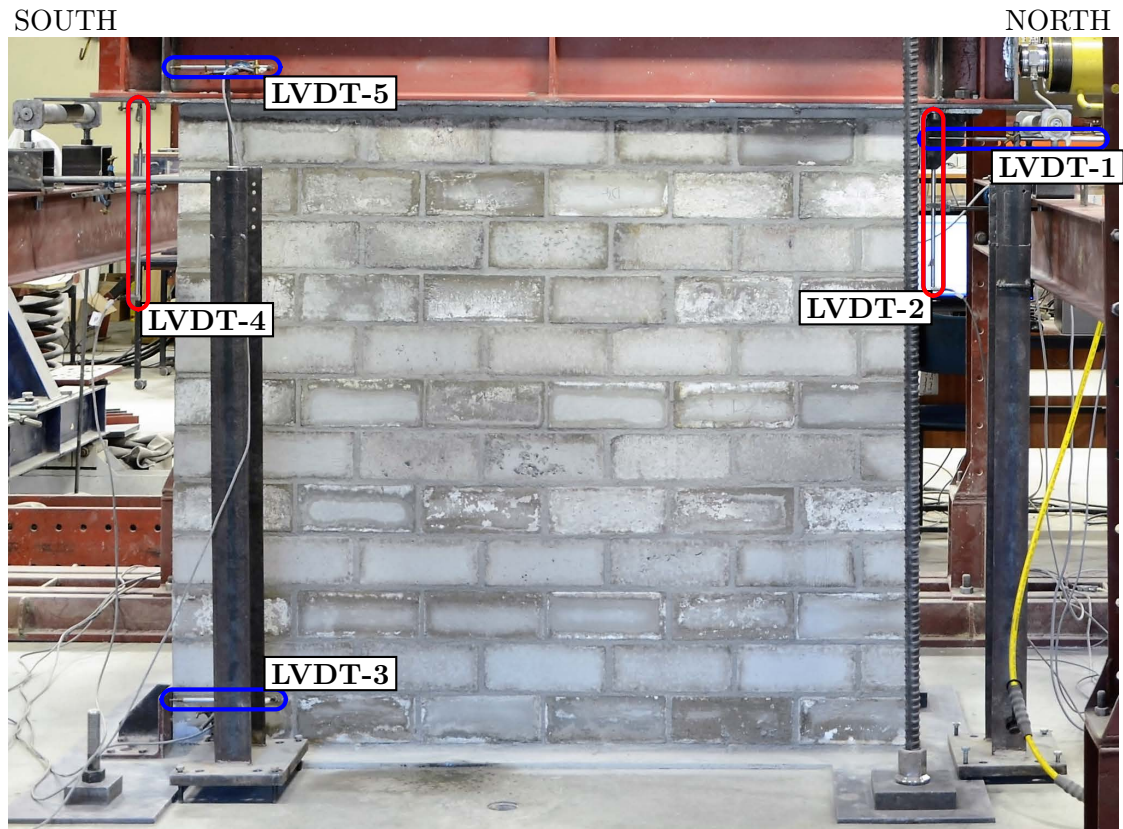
Close up View of Wall Indicating Locations of LVDTs
